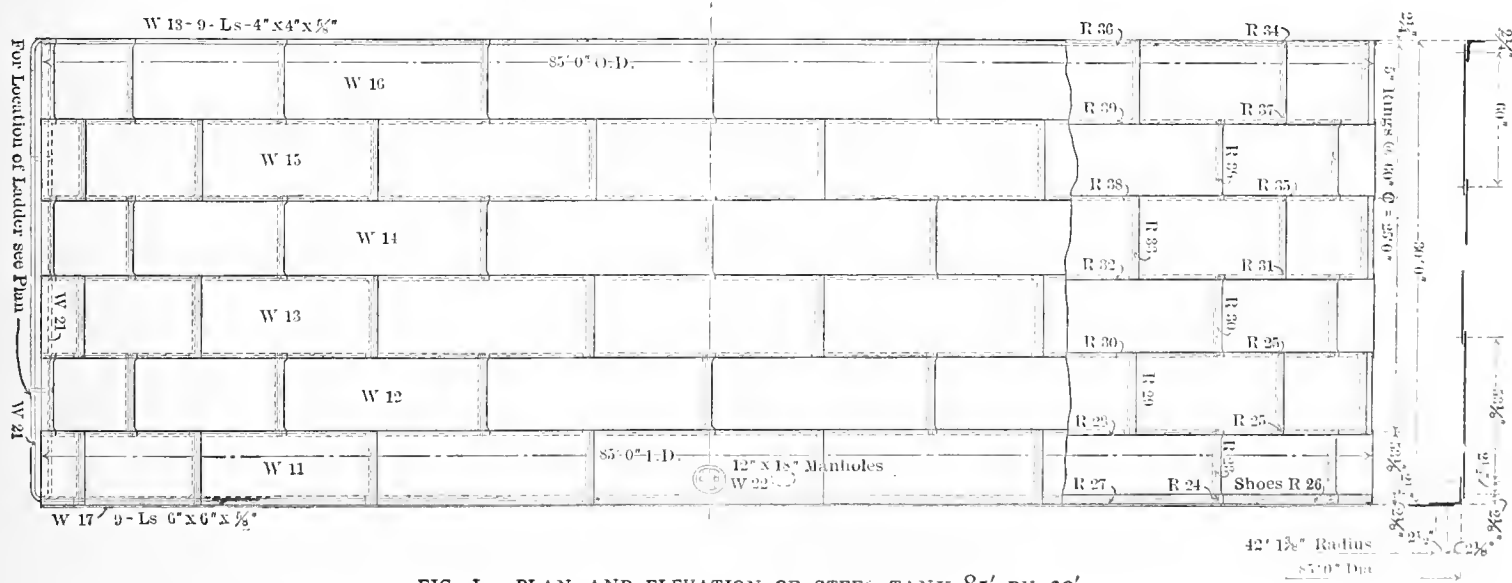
PLAN AND ELEVATION OF STEEL TANK 85' BY 30'.
